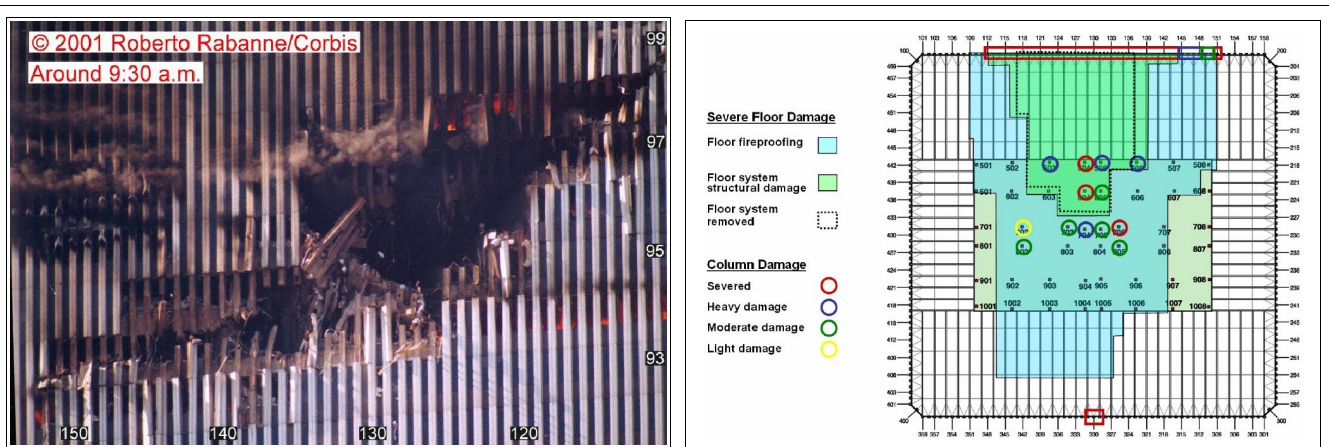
(Left) Impact Damage observed on the north face of WTC1. (Right) One estimated impact Damage scenario of WTC1. (Source: [34]).
